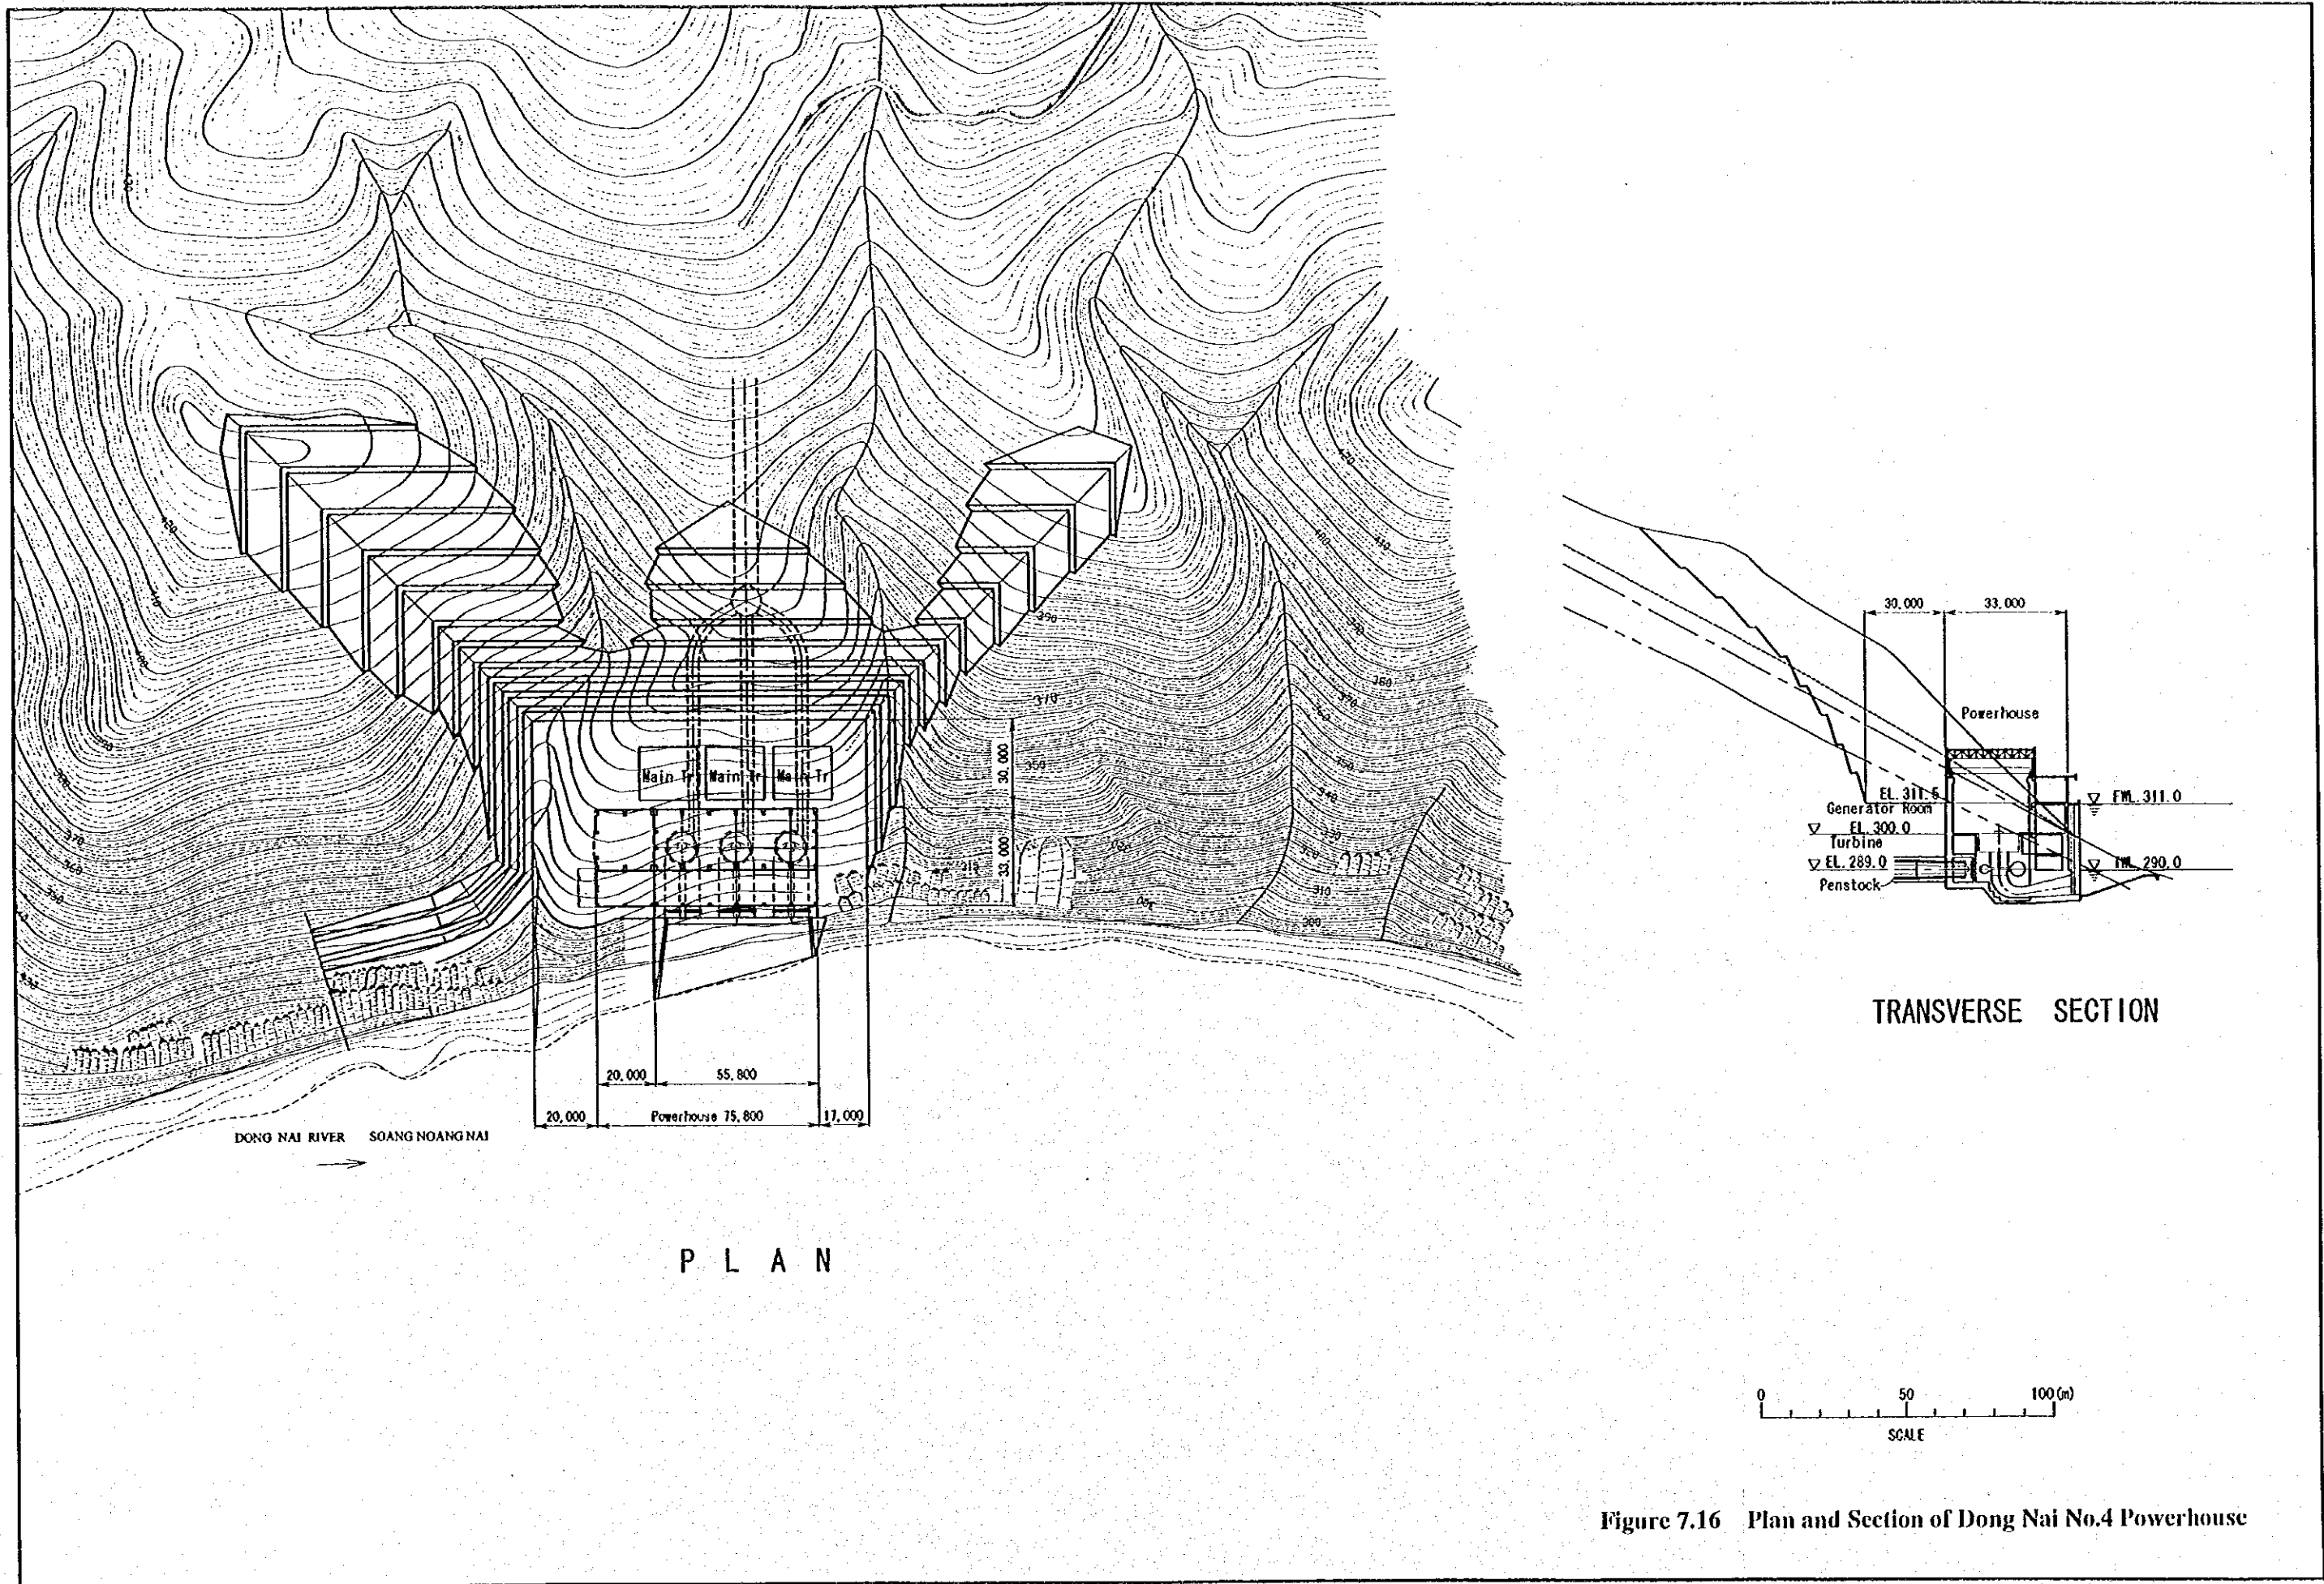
Plan and Section of Dong Nai No.4 Powerhouse
